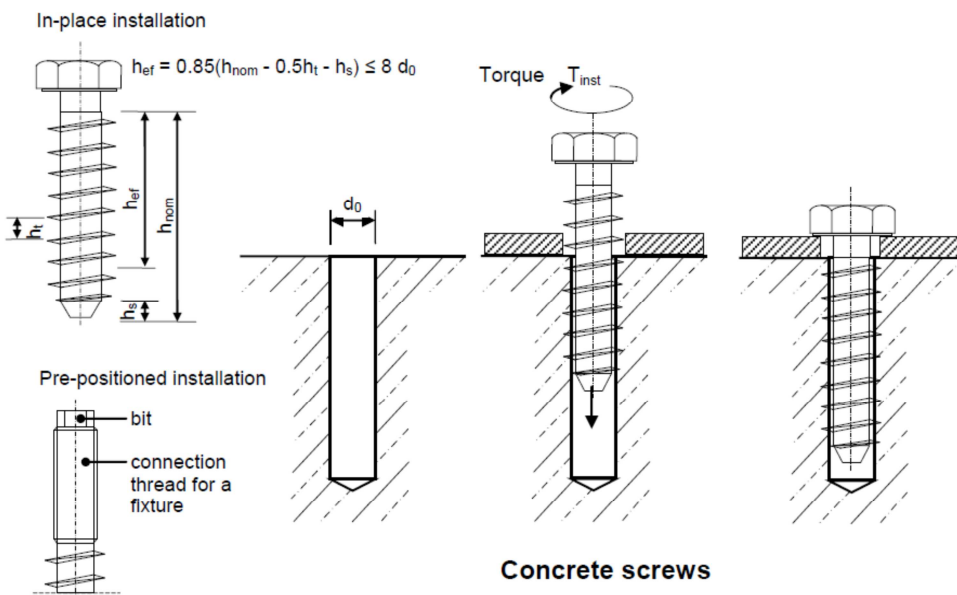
Displacement-controlled undercut anchors (technique c), insertion of a special threaded screw cutting the base material (ETAG 001 2013)
